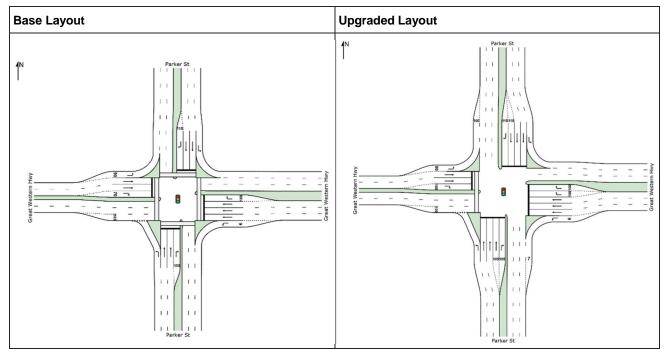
2021 with Links Road extension - Great Western Highway/Parker Street
